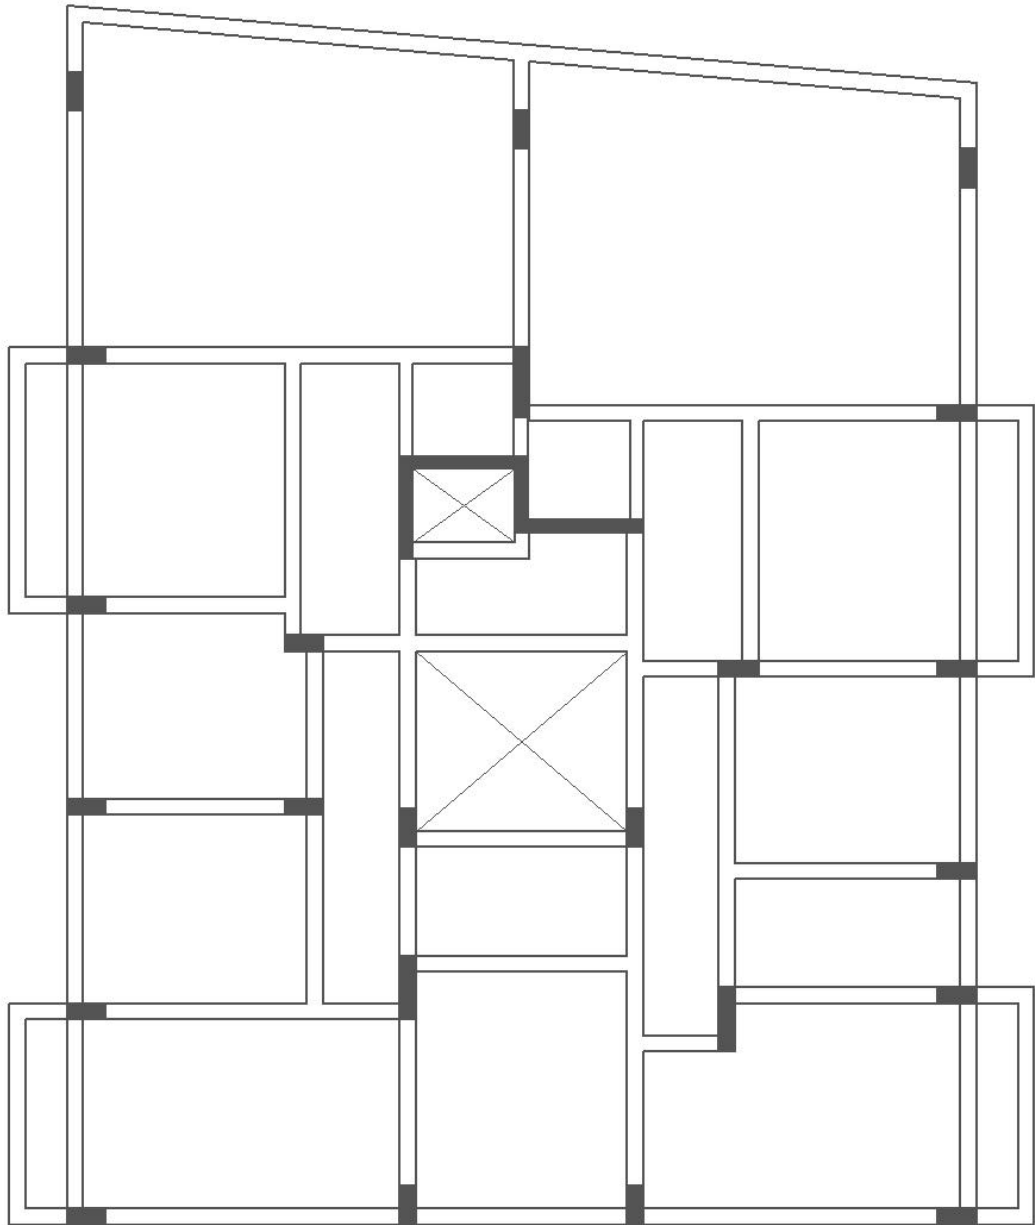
Structural Plan of Model-1 with Irregular Structural System
